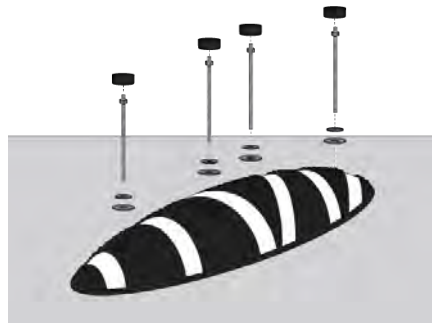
Install the anchors. To ensure that the threaded rod is correctly anchored, it should be rotated while being inserted into the hole (full of resin) so that is covered completely with resin. Once the resin is dry, tighten the nuts with the socket wrench.
